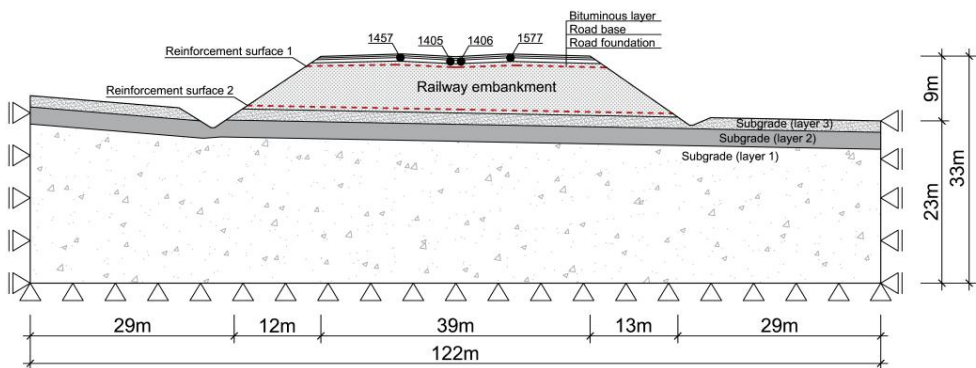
Scheme geometry, boundary conditions and selected points of road foundation layer
